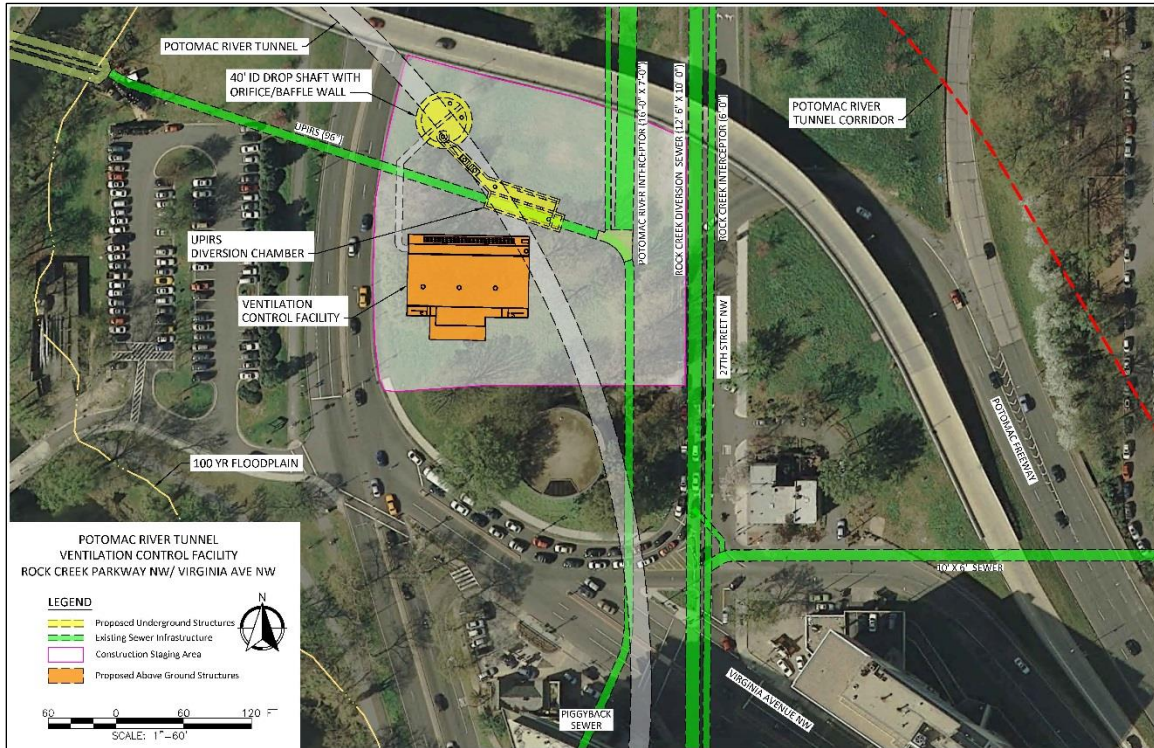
Ventilation Control Facility and UPIRS Diversion Structure Site
